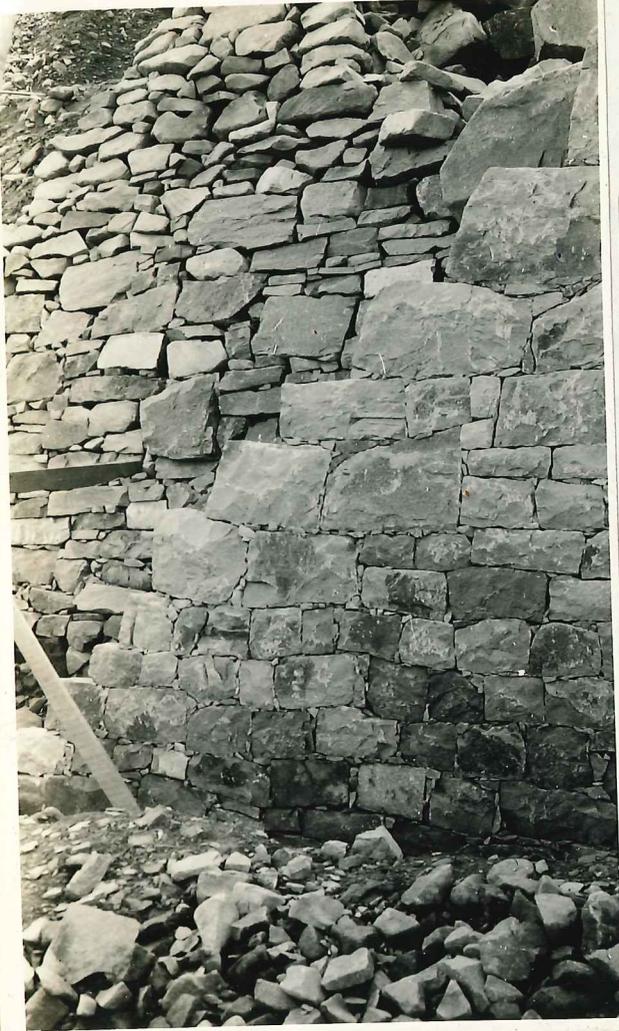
Showing New Wall Being Built and the Old Wall Behind.
